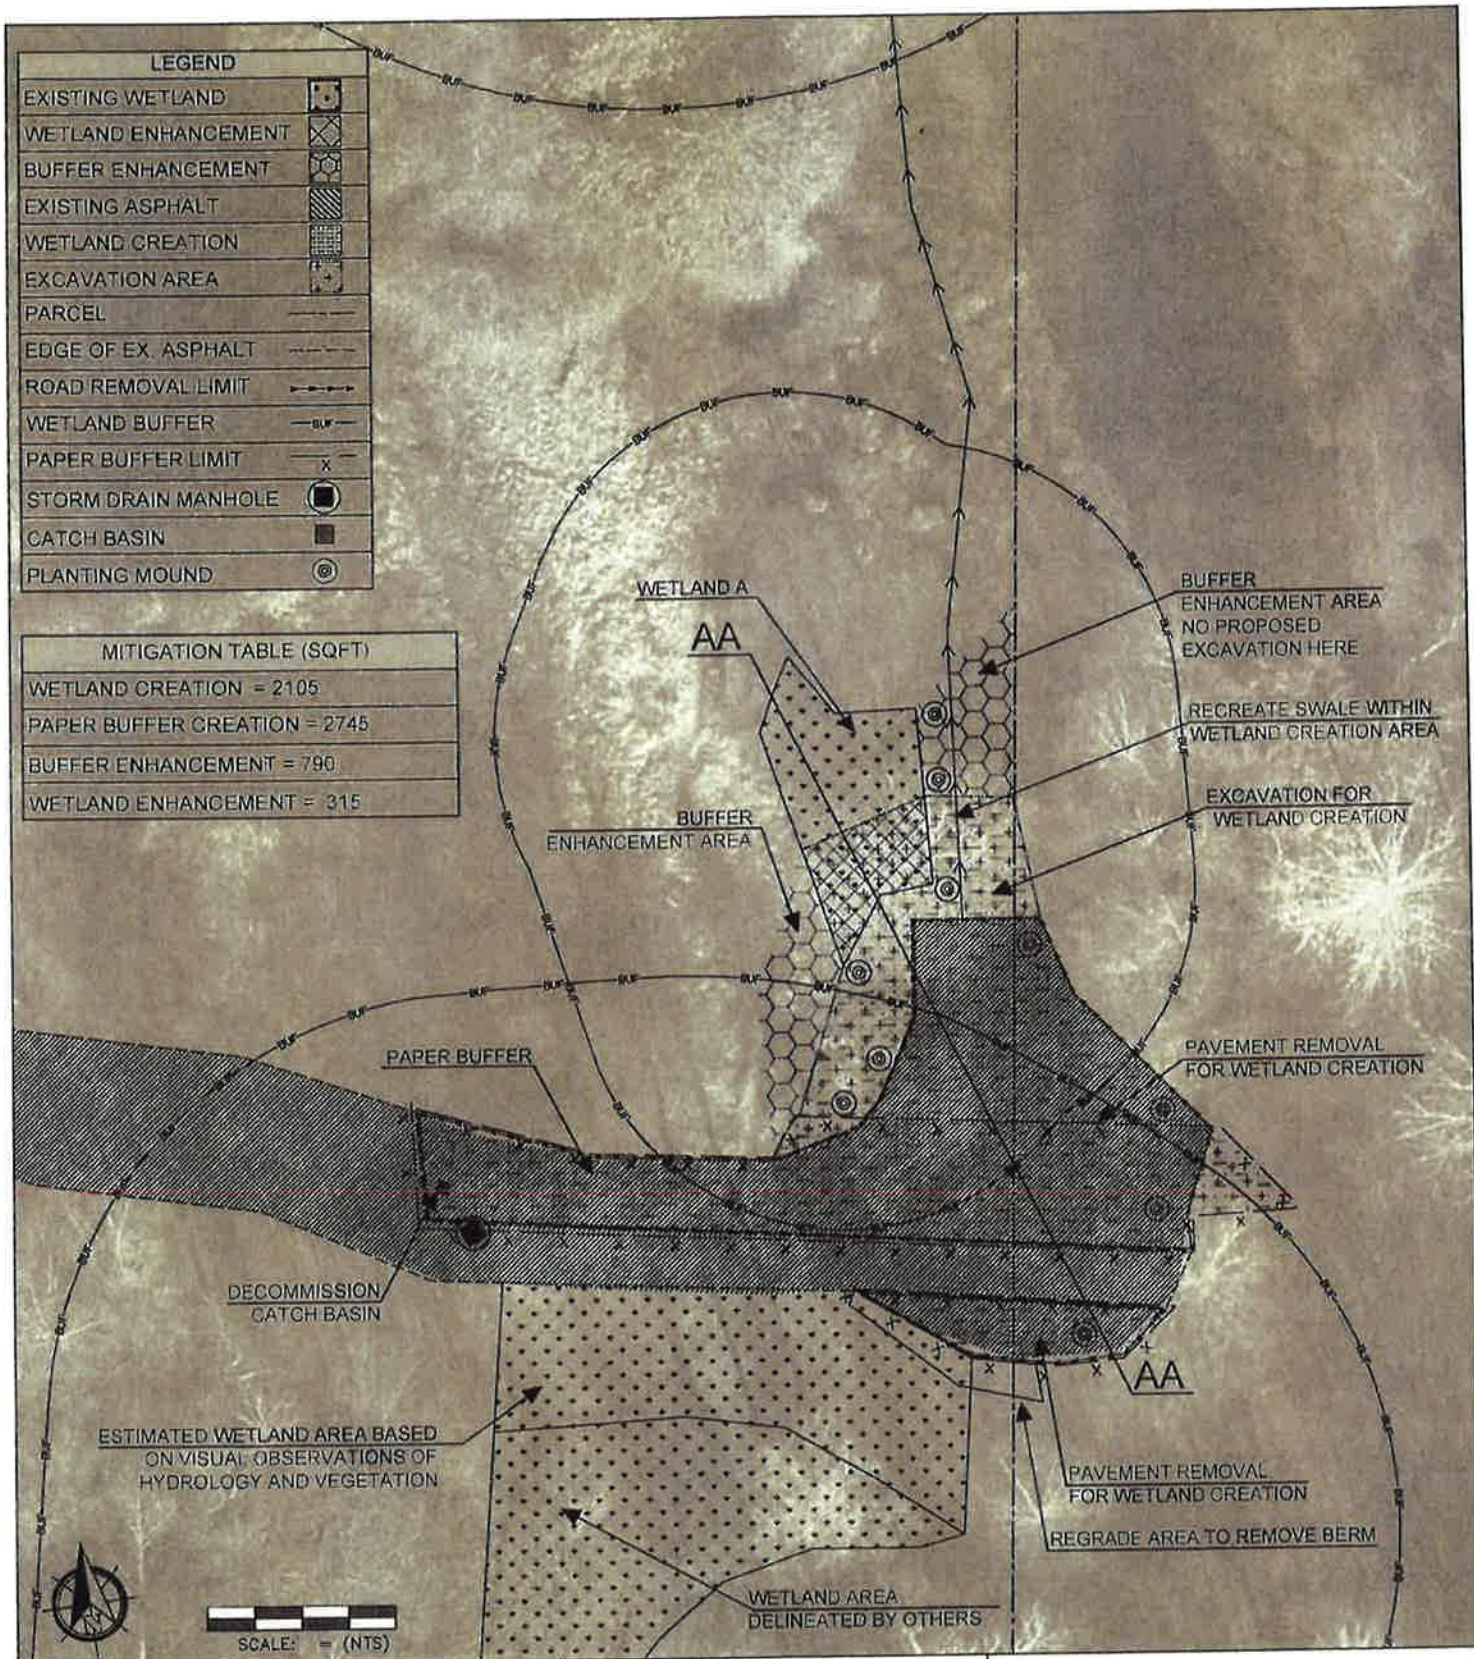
ON SITE PROPOSED CONDITIONS
